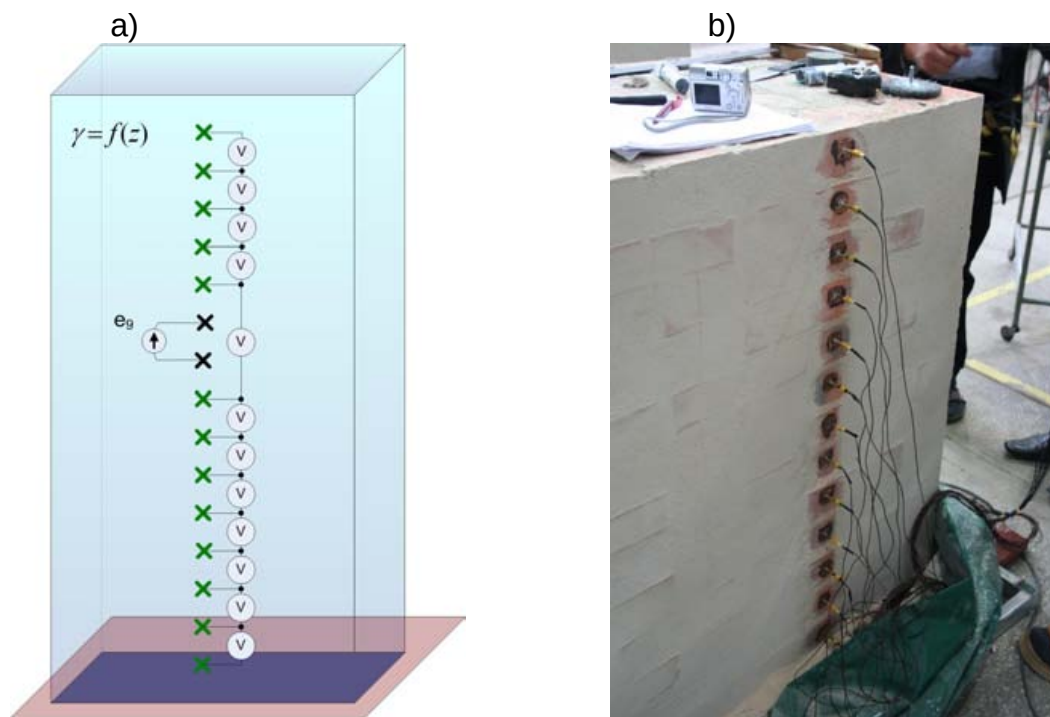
Model of brick wall: a) analytical model, b) the photography of model
